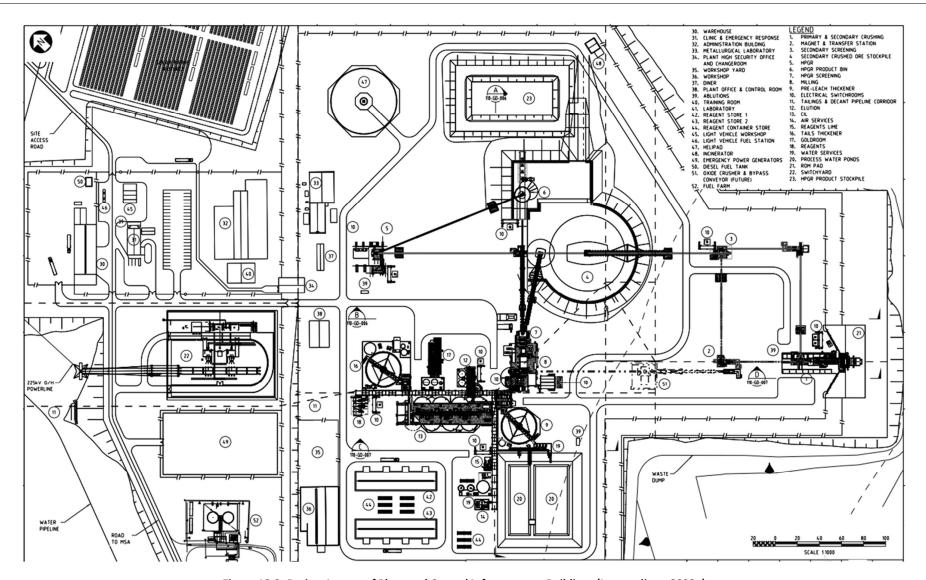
Project Layout of Plant and Central Infrastructure Buildings (Lycopodium, 2022a)
